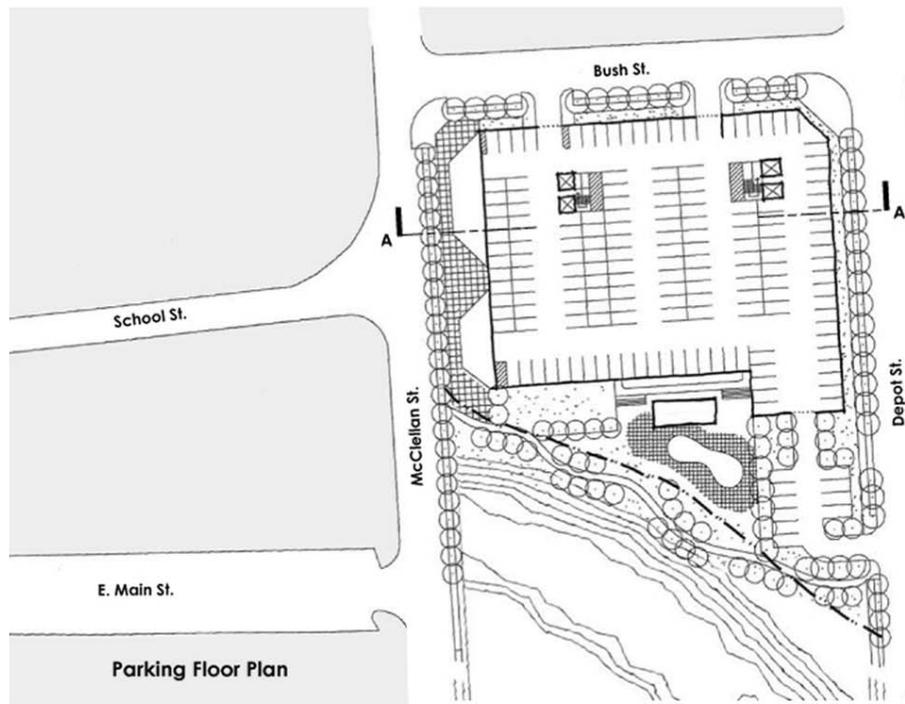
Plans and Renderings for Depot Street Site Scenario 5
